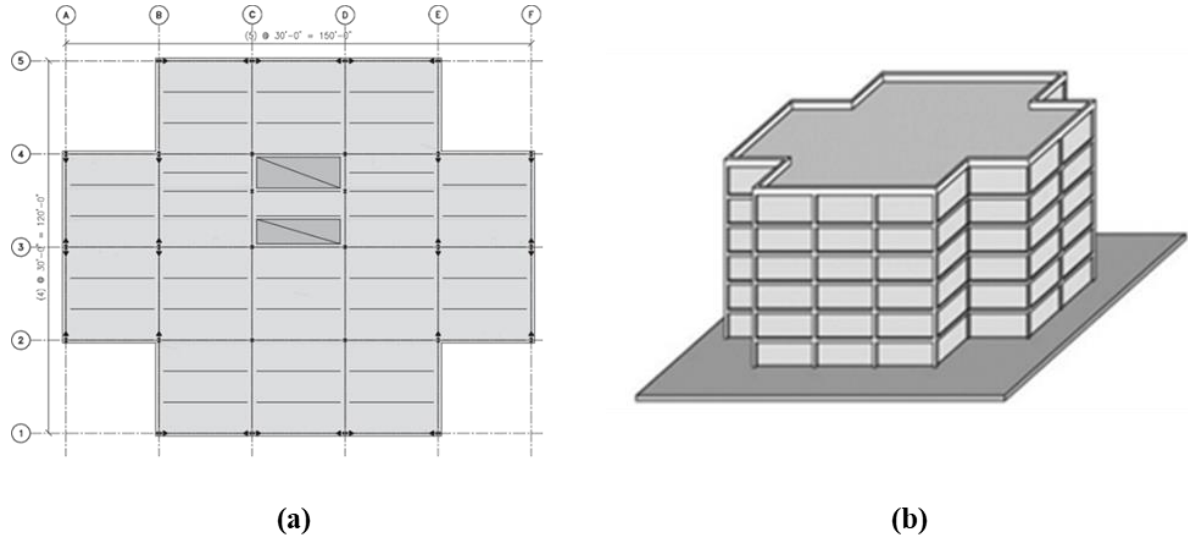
(a) Floor framing plan; (b) Isometric (3D) view of the buildings above ground.
